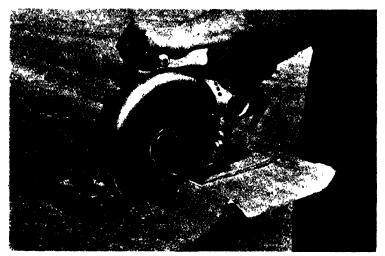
CUTTING CEMENT ASBESTOS SHEETING WITH "RIPSNORTER" SAW
